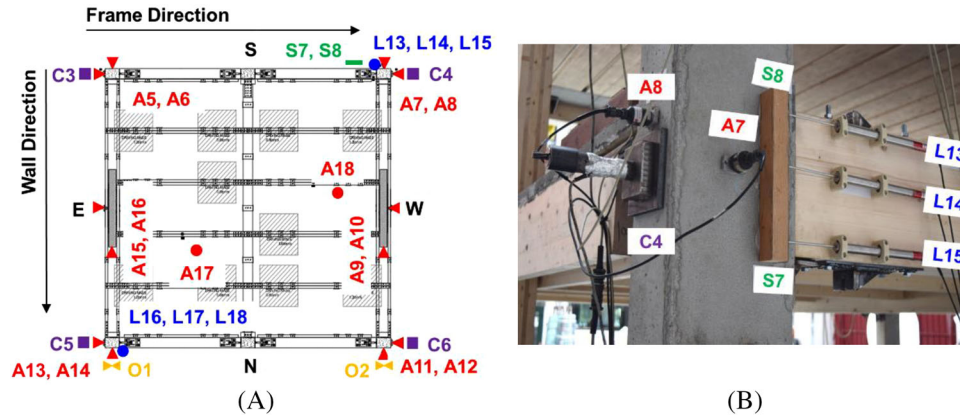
Instrumentation layout for the first building level: (A) accelerometers (A), LVDTs (L), strain gauges (S), optical devices (O); (B) photo of the sensors located in the South-West beam-column joint.
